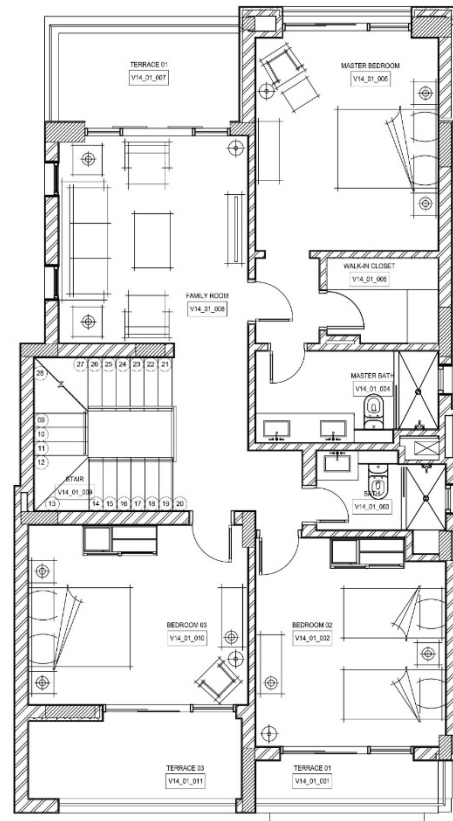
First Floor Plan of Villa Type 14 (Emmar Misr for Development, SAE, 2019)
